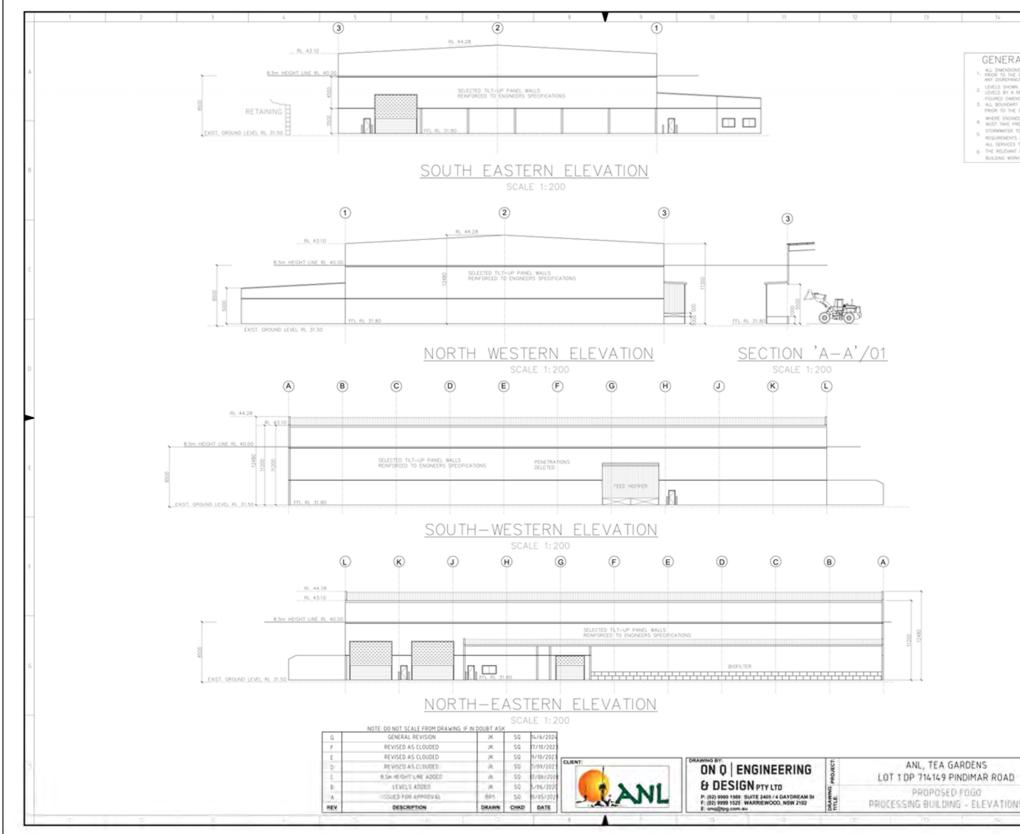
Elevation plan for the proposed extension of approved wood waste processing building for the FOGO processing operation transition at the Tea Gardens Facility
